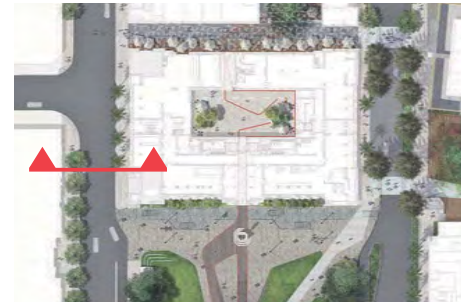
Streetscape Sections Key Plan (rendered plan behind indicative only)
